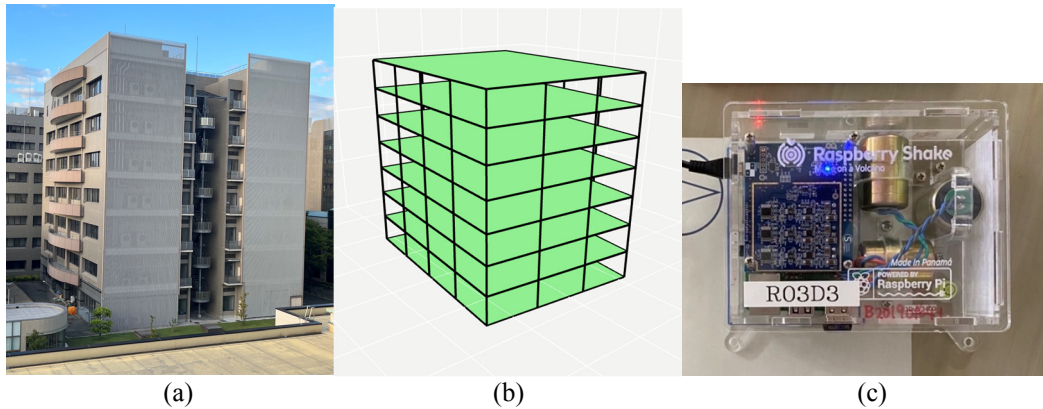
a 7-story SRC building: (a) photo of the building, (b) structural model, and (c) measurement device.
